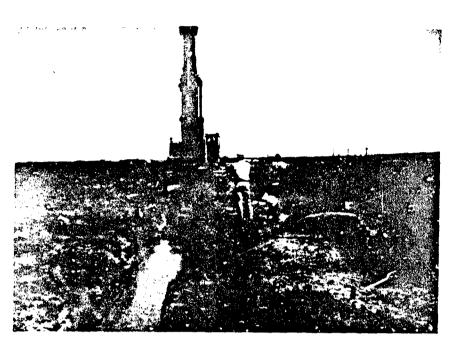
WEST END SLURRY TRENCH APRIL 16, 1981
